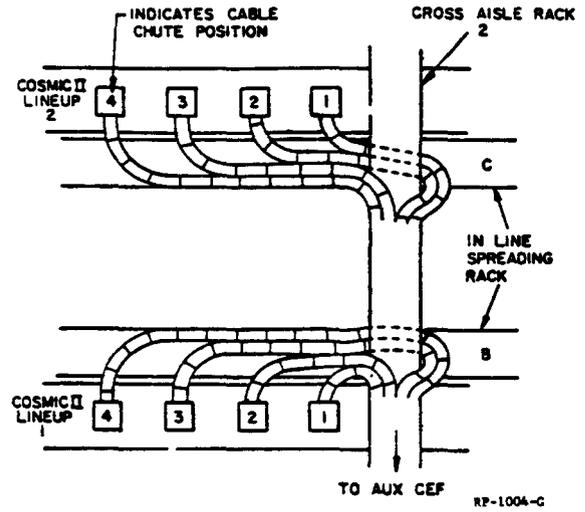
B "GULL WING" CABLE GROUP POSITION - FOUR MODULES
